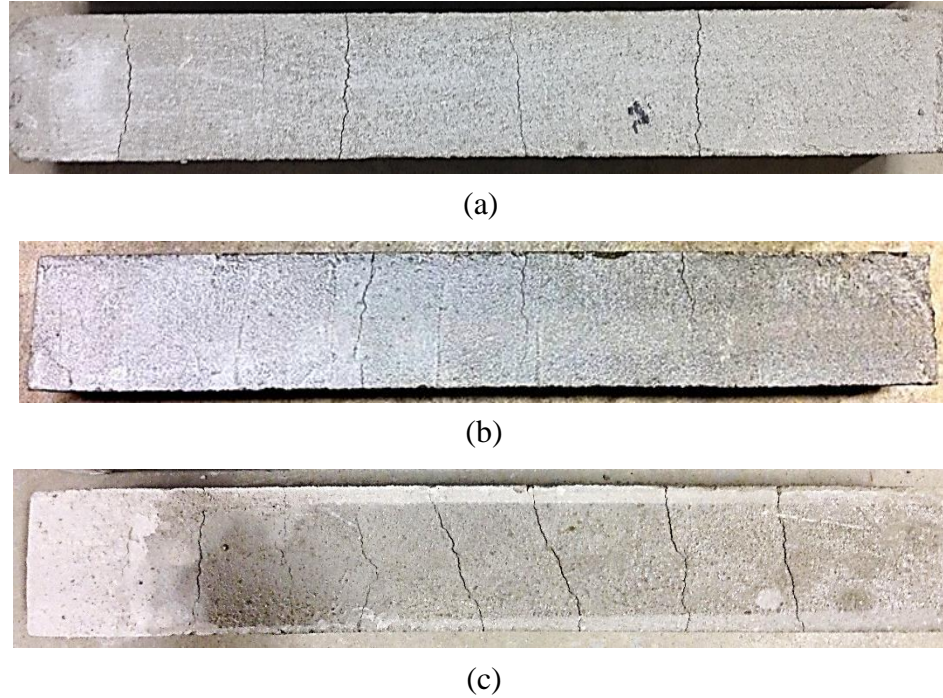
Overlay cracks after 4 hours of testing (a) Control (88 mm² crack area) (b) MG-30 (47 mm² crack area) (c) EG-10 (218 mm² crack area)
